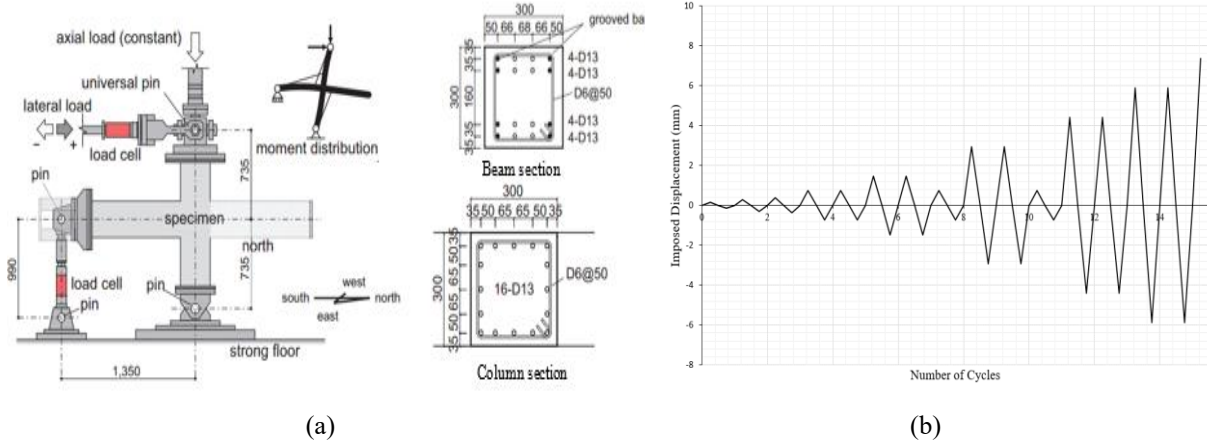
(a) Geometry and reinforcement details of beam column joint [10] and (b) imposed displacement history of the interior frame joint.
